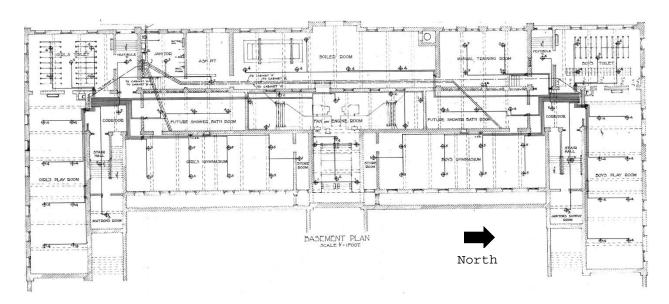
Fanning School Ground Floor Electrical Plan (Courtesy of St. Louis Public Schools).
